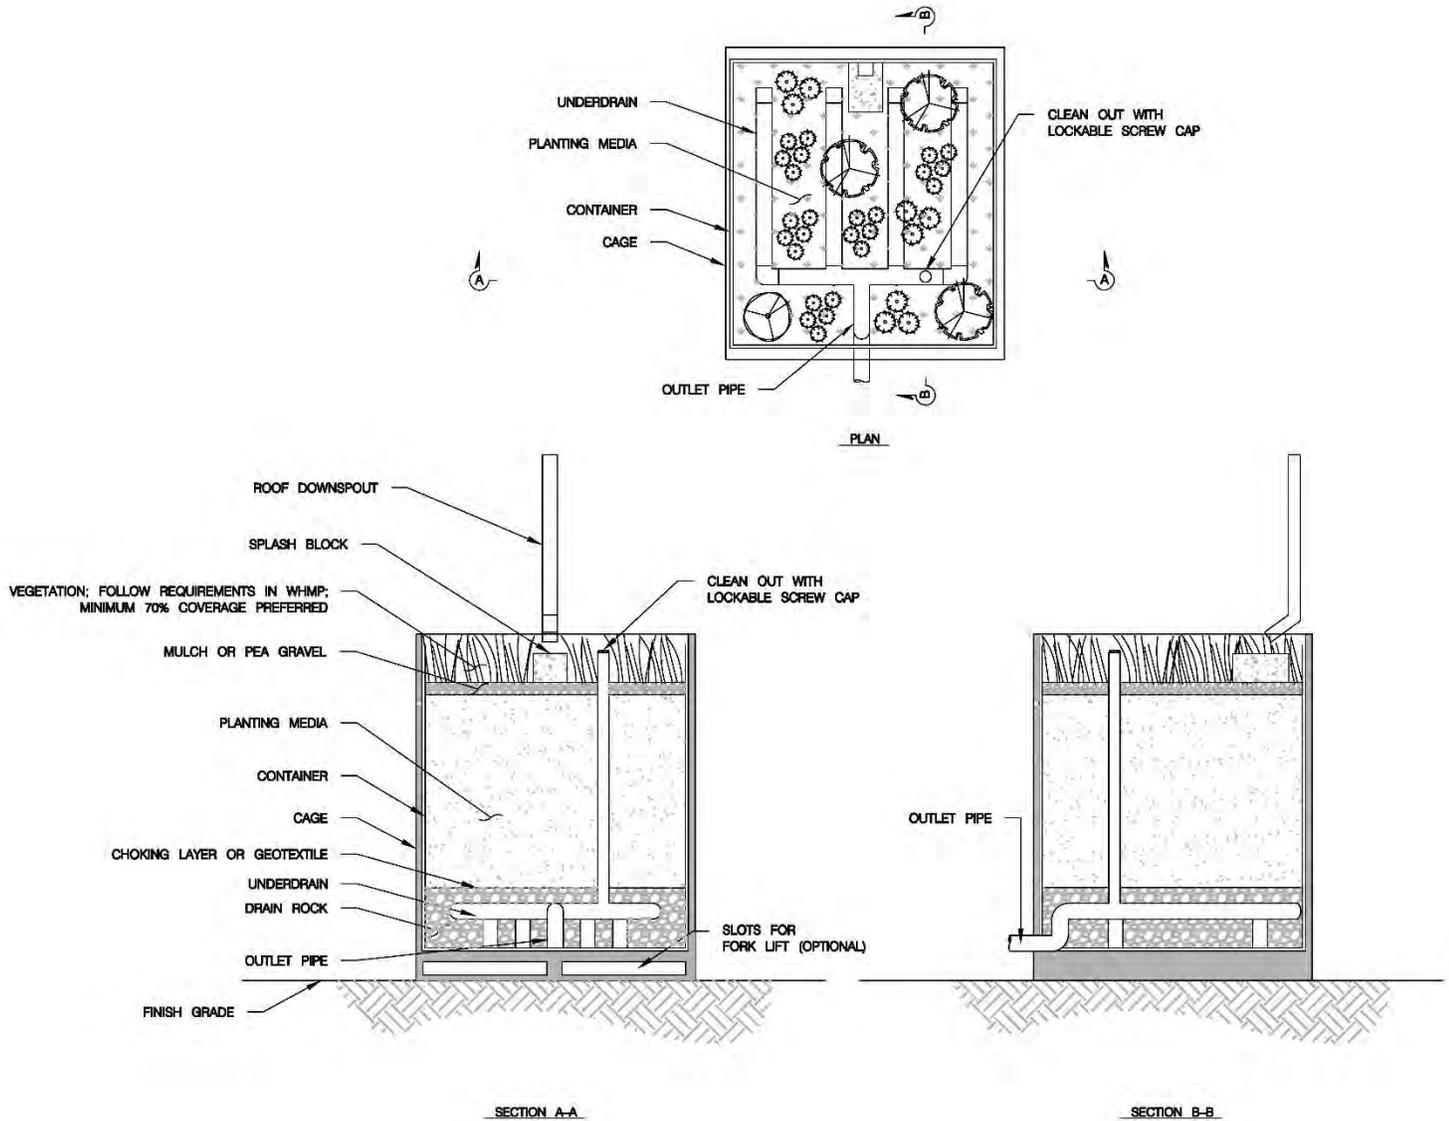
Building BMPs Schematic Plan and Section Views (Planter Box Filter)
